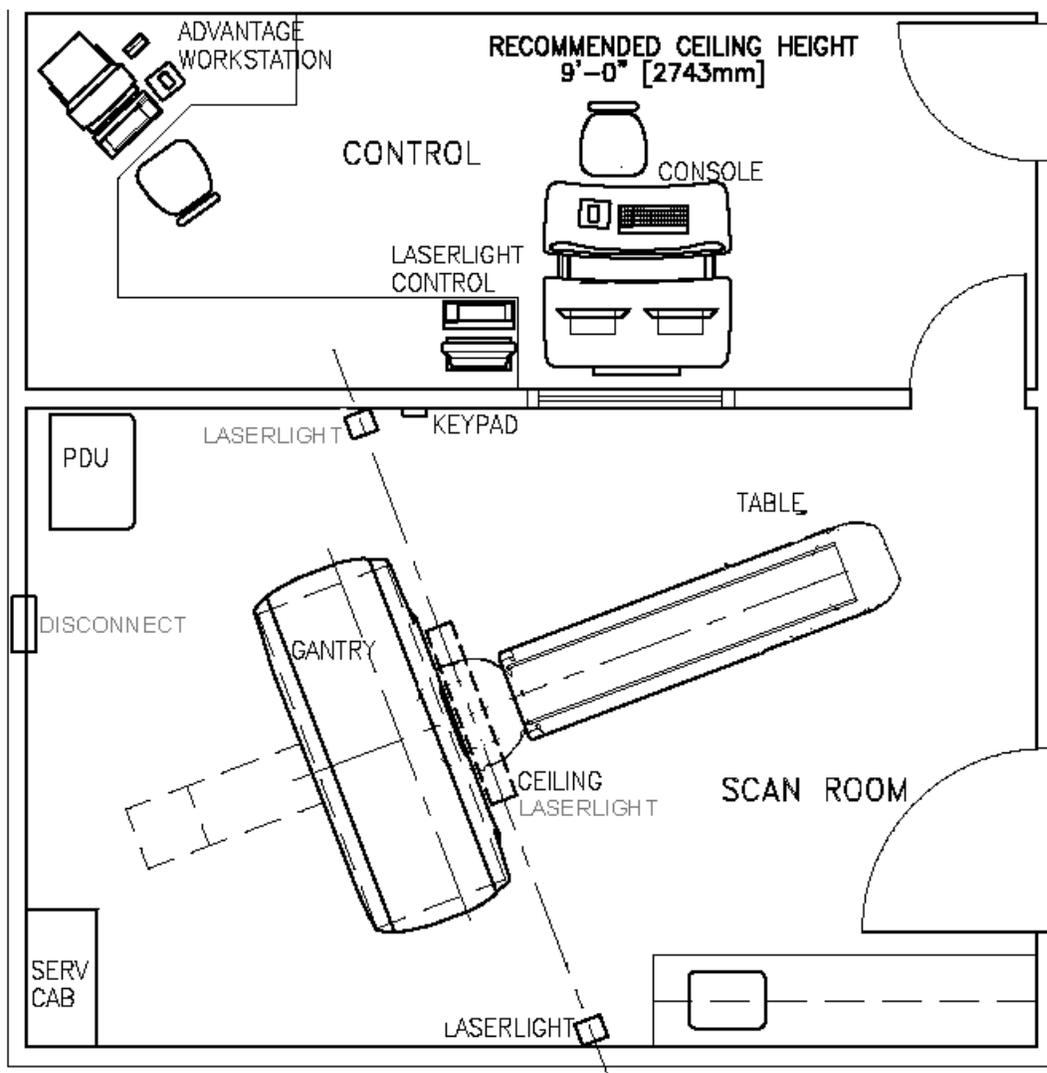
Typical Room Layout with CT Simulation Laser Alignment System
